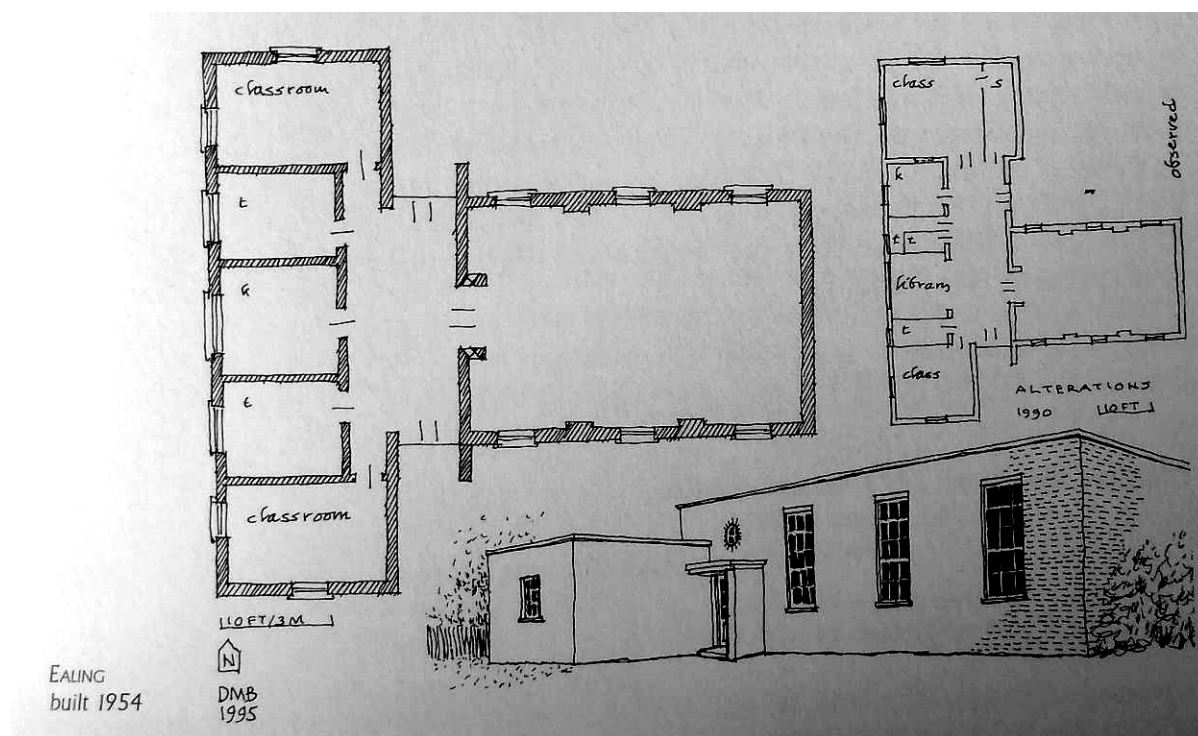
Plan and elevation, from Butler Vol. 1, p. 389
